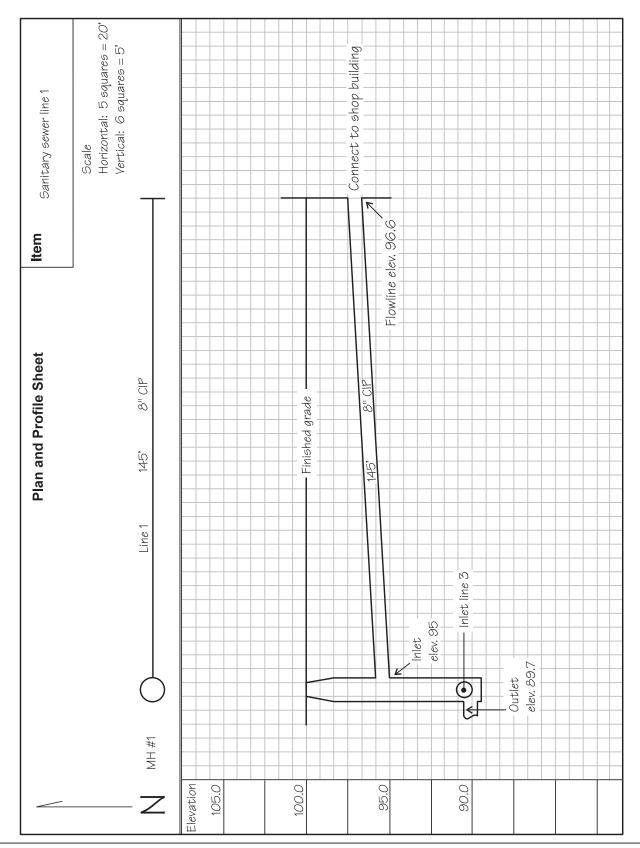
Sanitary sewer line 1, plan and profile sheet
